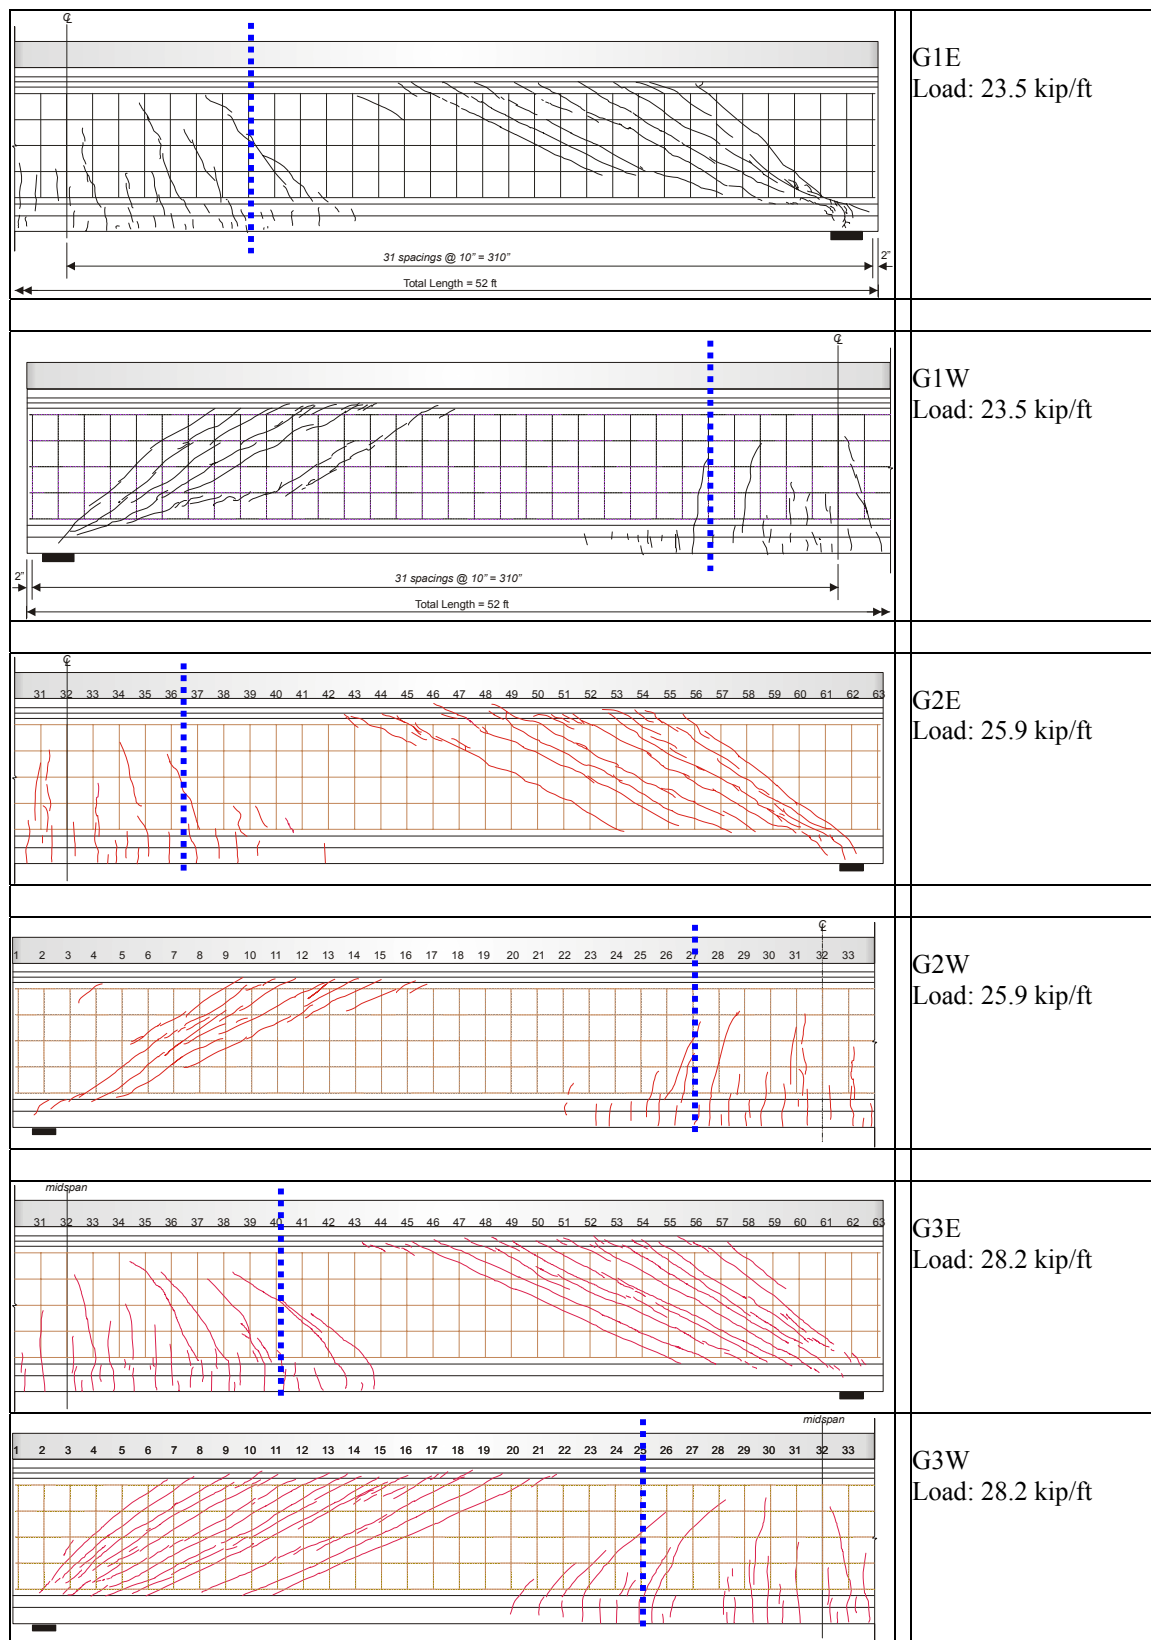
Flexure-Shear Cracks for NCHRP 12-56 Girder Tests
